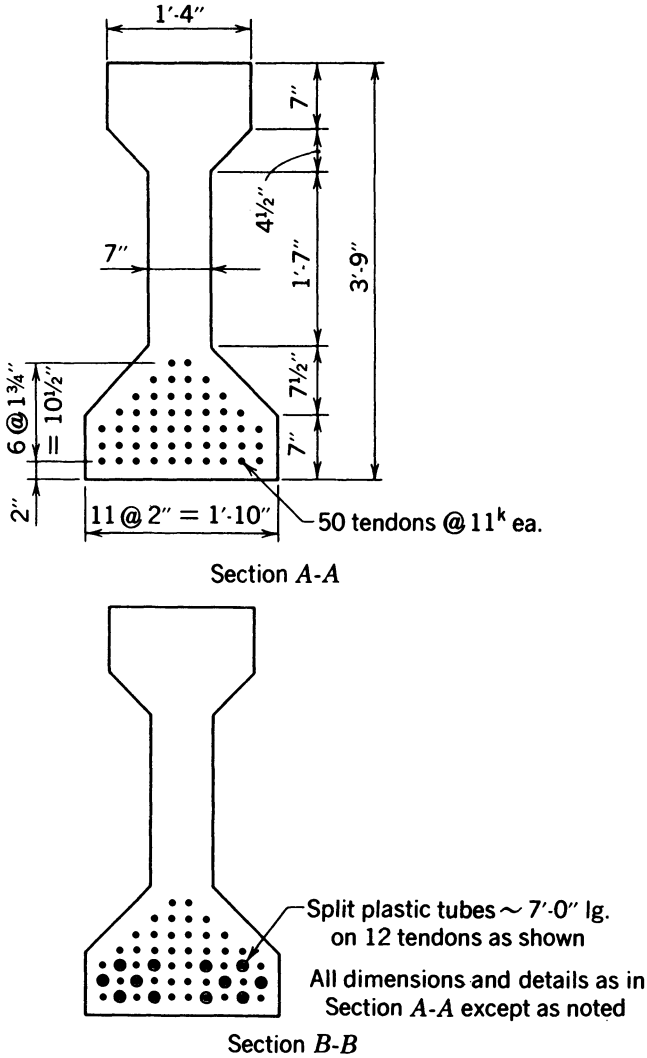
AASHTO-PCI type III bridge stringer pretensioned with 50 tendons. Section A-A shows details in typical section. Section B-B shows details near end where plastic tubes are used to prevent 12 tendons from bonding.
